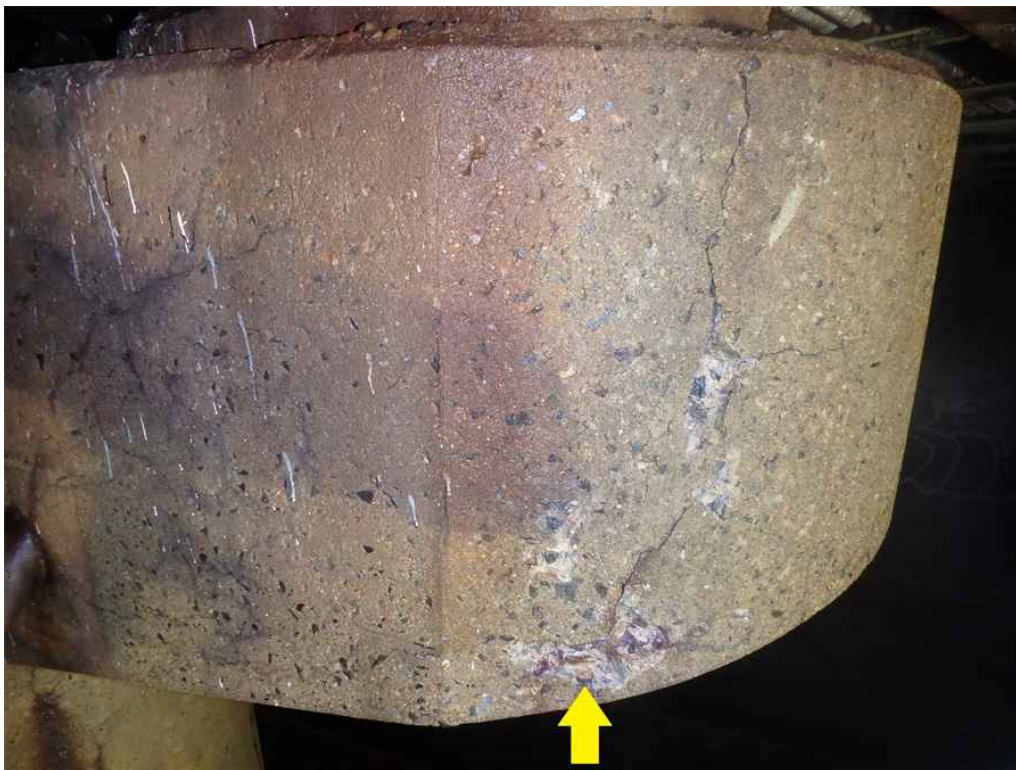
Pier 1 cap, south face just east of beam 2A, looking northwest - vertical crack with adjacent hollow area and spall.
